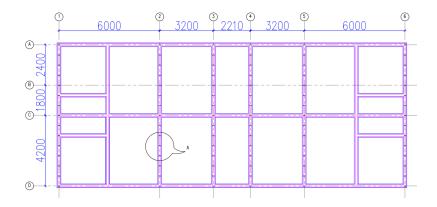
(a) – Ground floor framing plan used for G+5 building (Refer detail 'A' fig. 2 (c) for clarity
